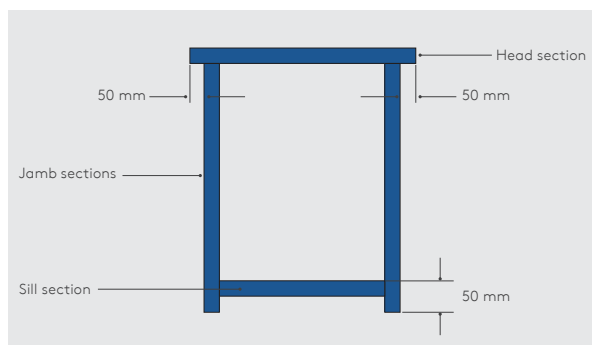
Kingspan Thermabate® Sill, Jamb & Head Sections
